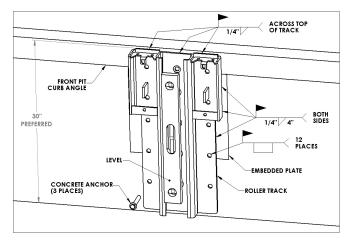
FIGURE C—WELDING ROLLER TRACK FRONT VIEW (WITH EMBEDDED PLATE)
